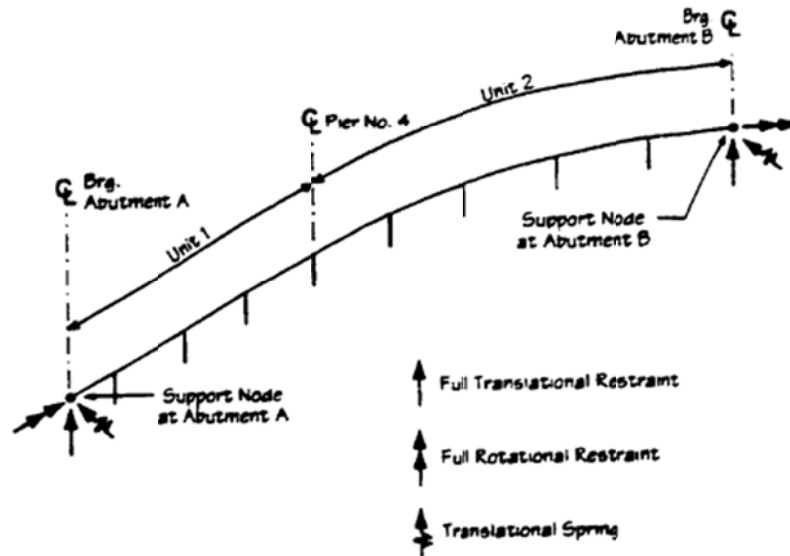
Bridge No. 1 – Details of Abutment Supports
